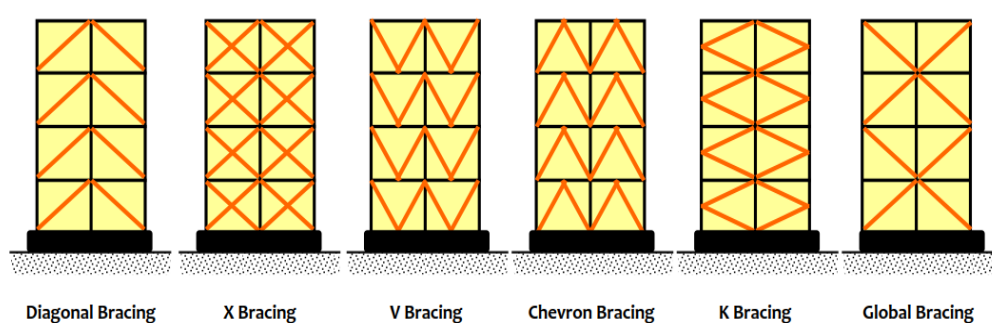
Types of Bracing in Buildings (Murty, et al., 2020).
